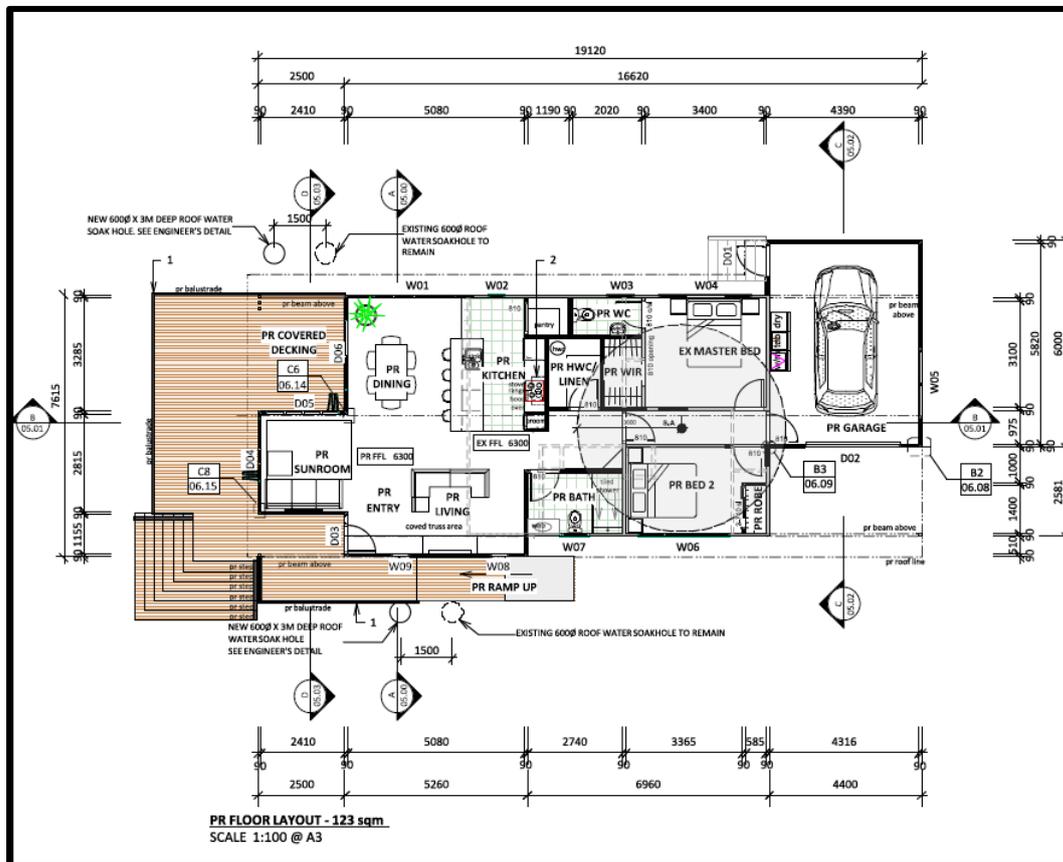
Proposed Floor Plan. Source: Mealings Architecture Plan Set
